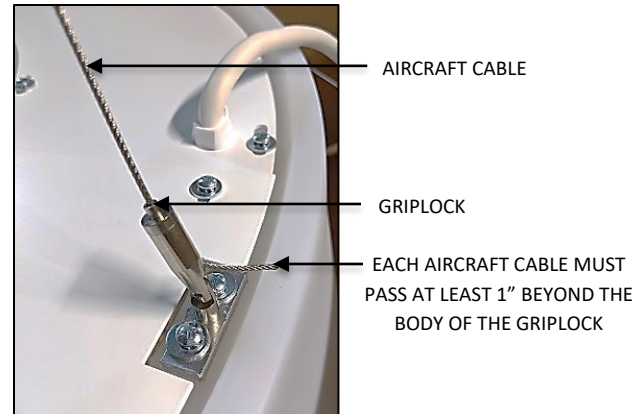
AIRCRAFT CABLE INSTALLATION
